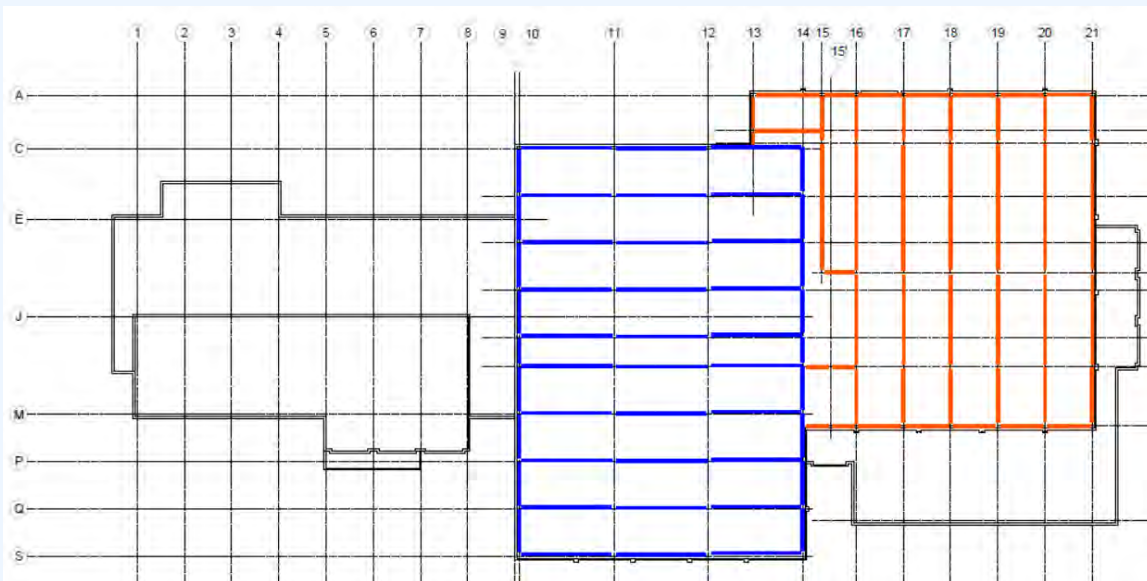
All colored lines shown indicate beams/girders. The blue lines support segment #2's roof. The orange lines support segment #3's roof.
